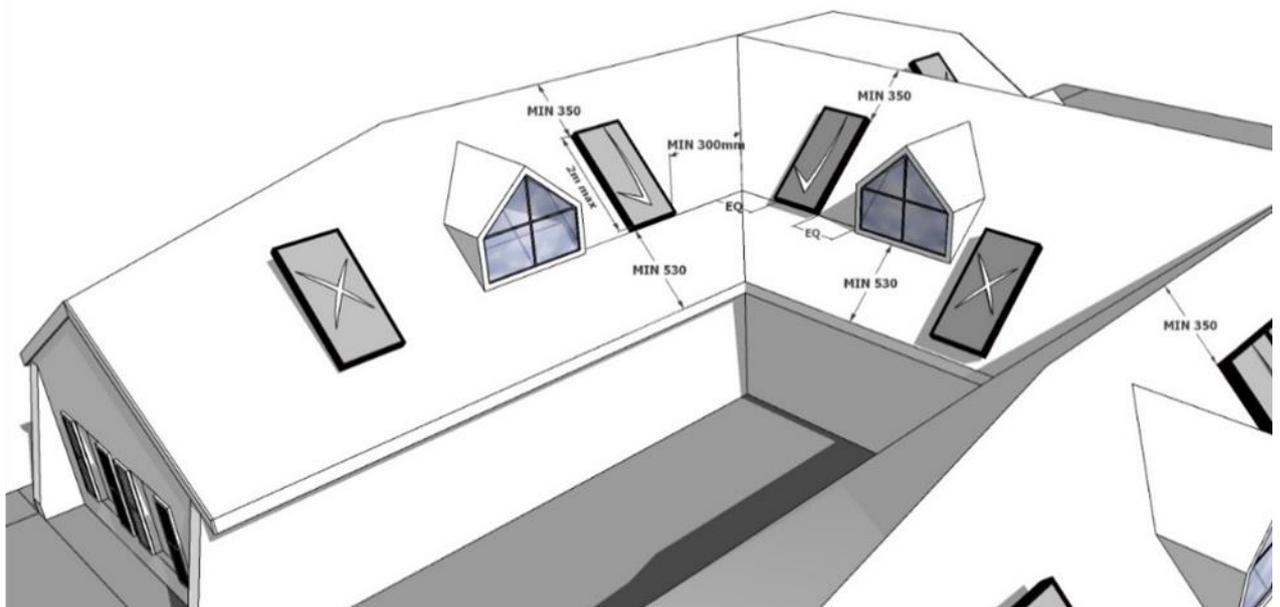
Acceptable and non-acceptable panel positions on inward facing roof pitches.
